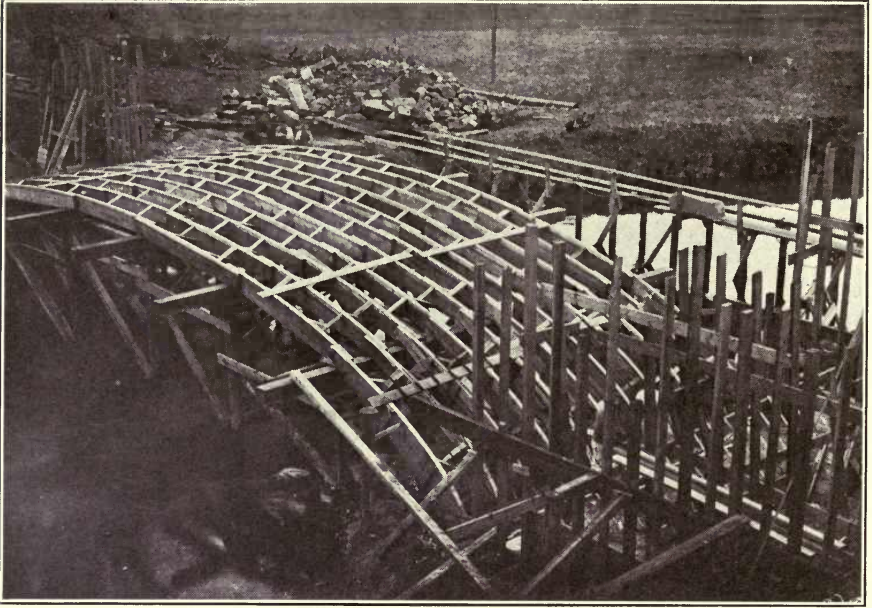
CENTERING OF ARCH BRIDGE, ELM STREET, CONCORD, MASS.
